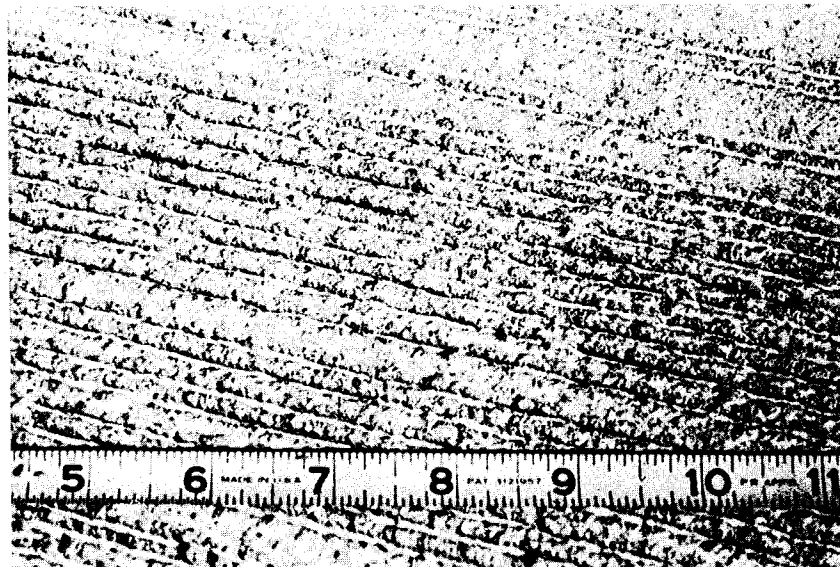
Test Section F-5: Burlap drag plus longitudinal
